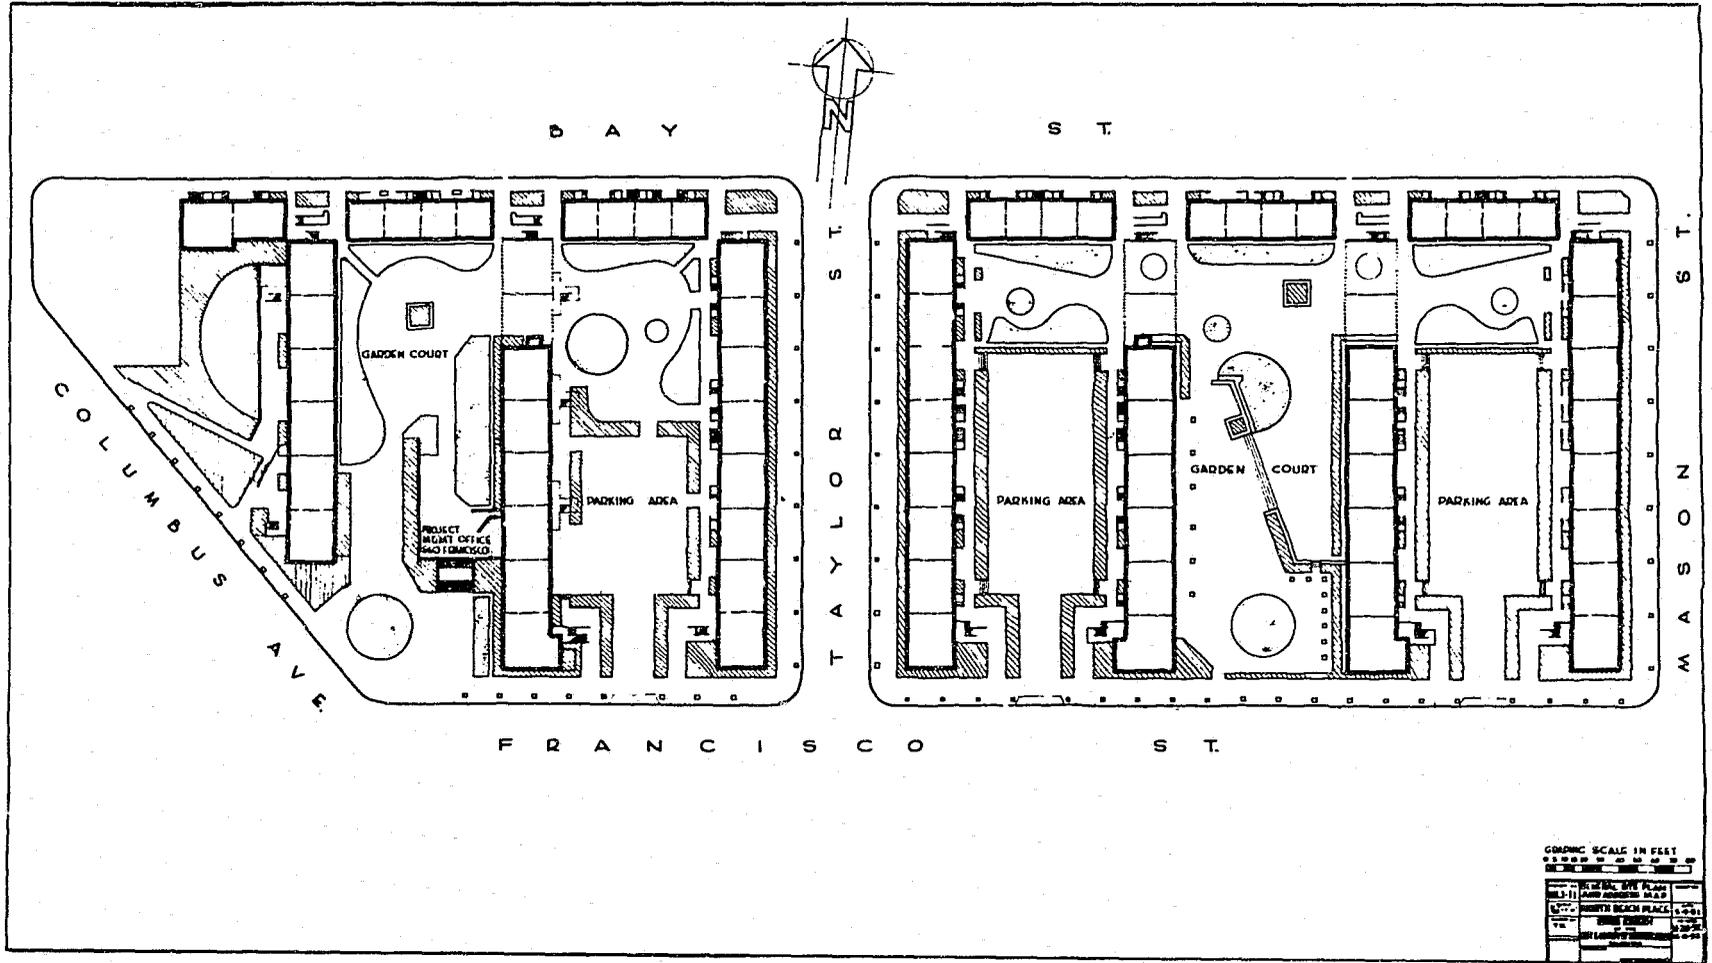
North Beach Place, San Francisco, Calif. Site plan.
